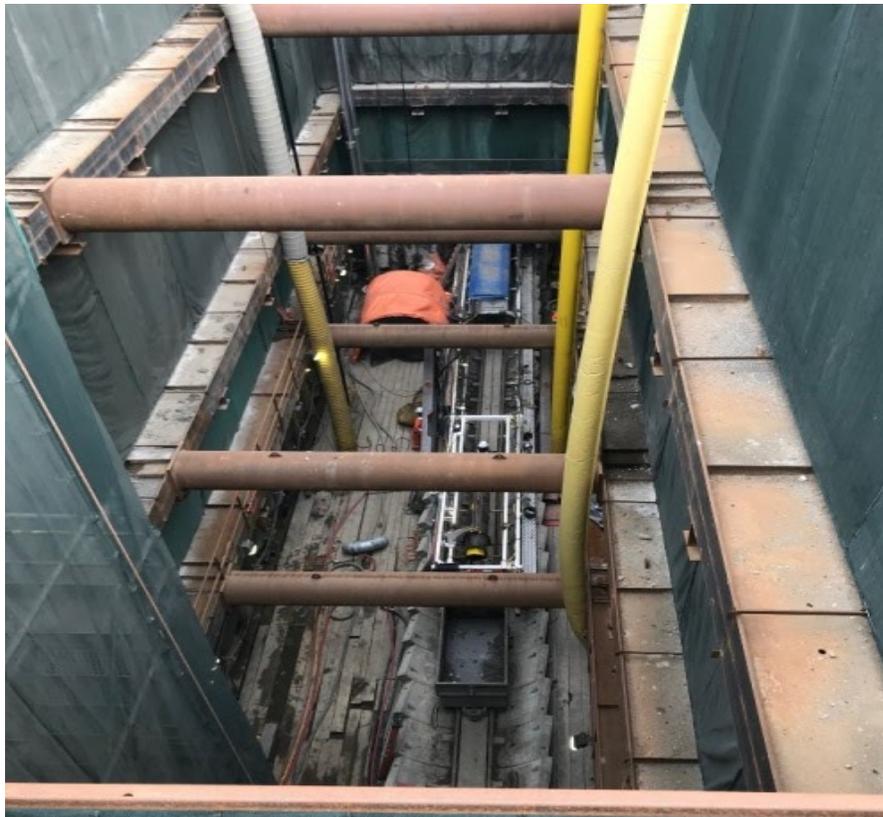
SESS SA10a, Working Pit and Installation of Tunnel Boring Machine
